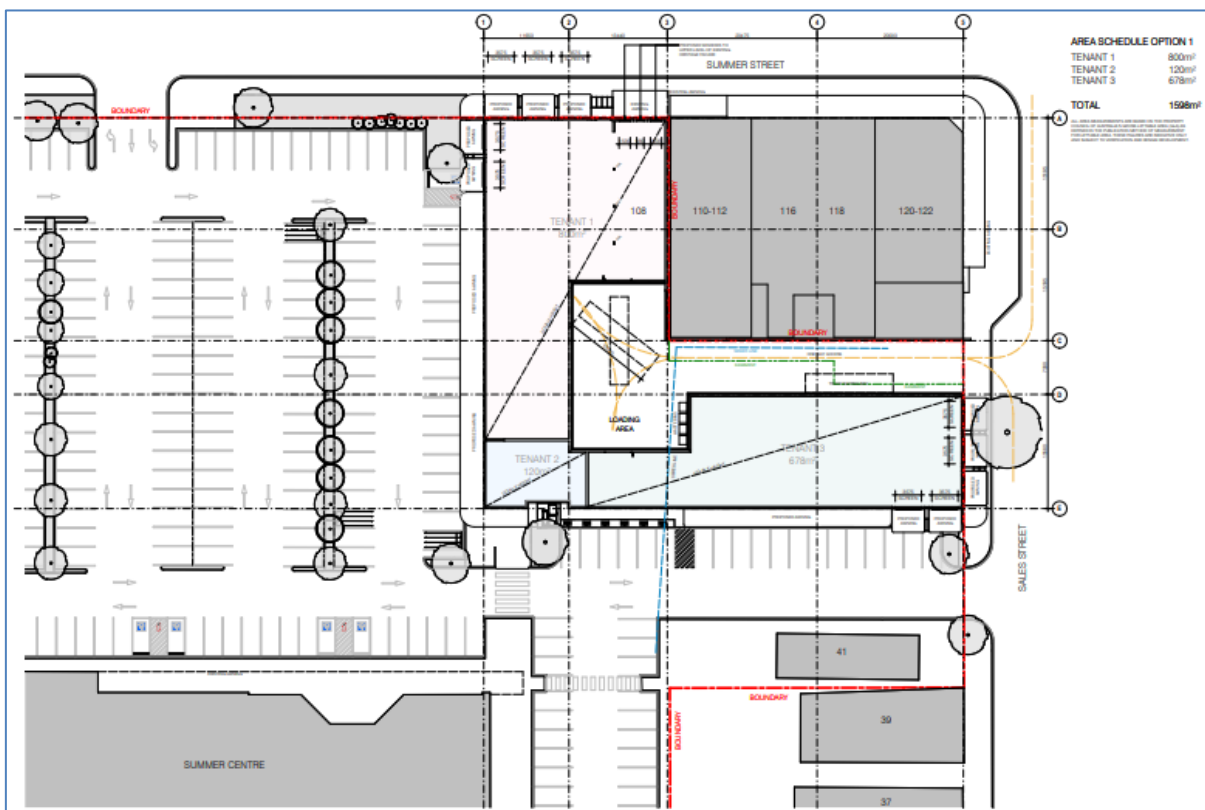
proposed level 01 plan (dwg DA24 [R04])
